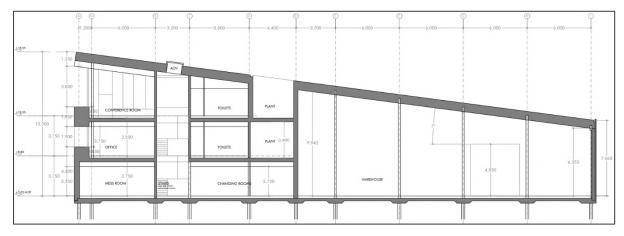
Section of Typical OMF Building (Extract from Drg. No. GA 100 01)
